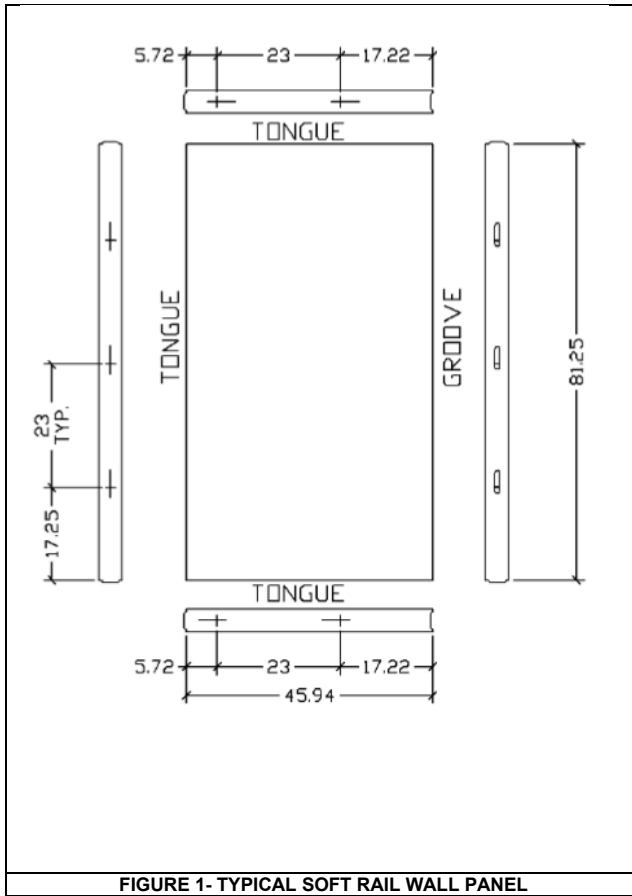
TYPICAL SOFT RAIL WALL PANEL
